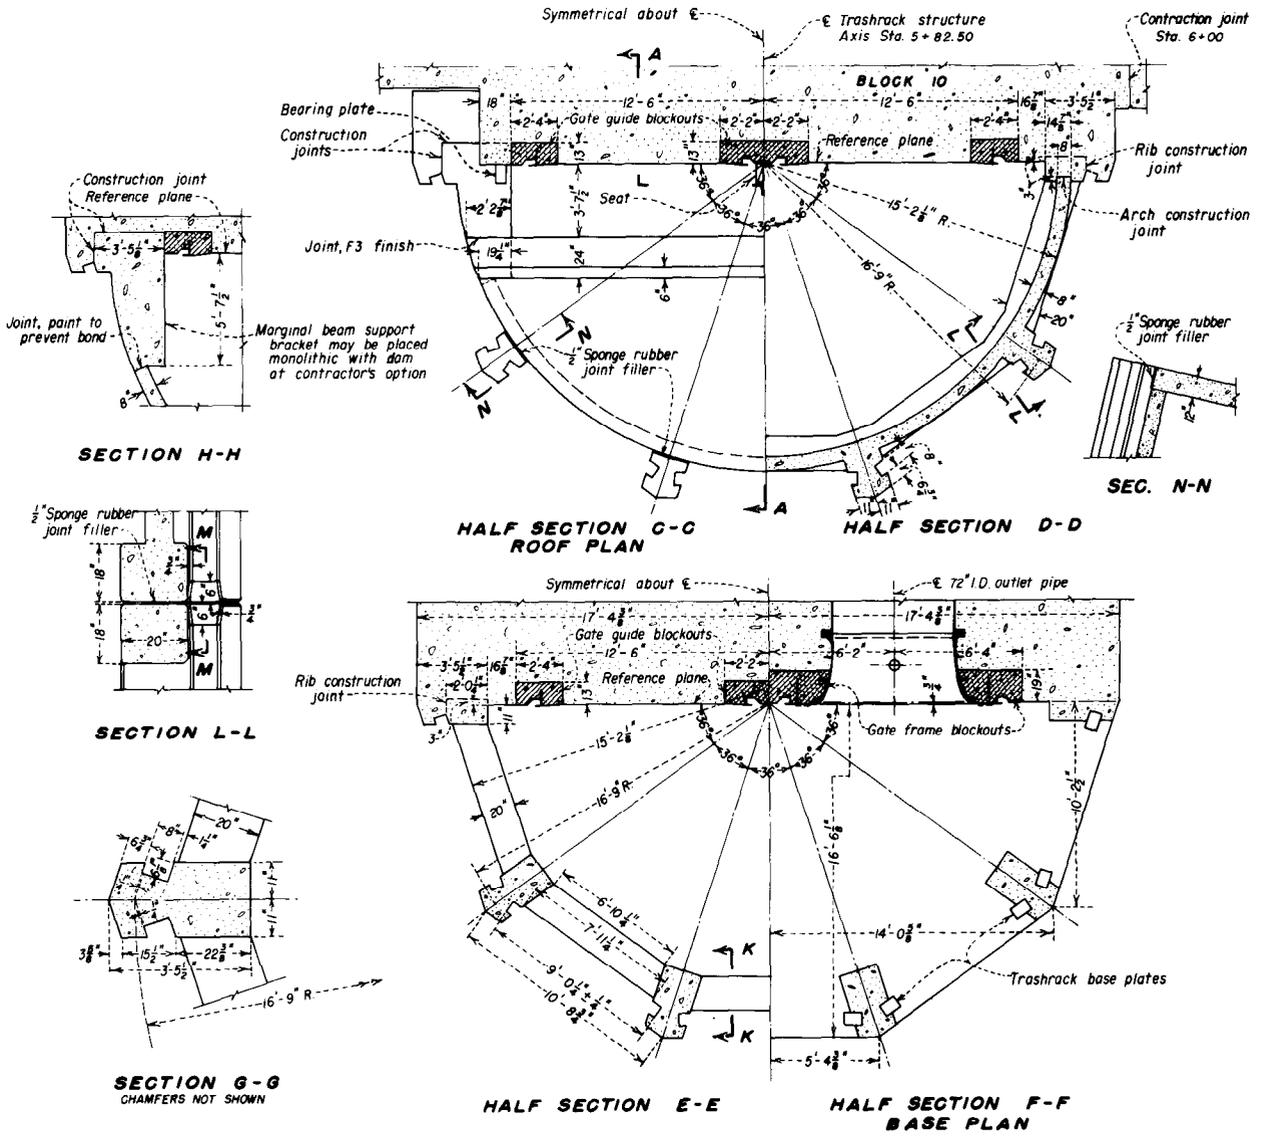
River outlets trashrack structure—plans and sections (sheet 1 of 2). —288-D-3063 (1/2)
